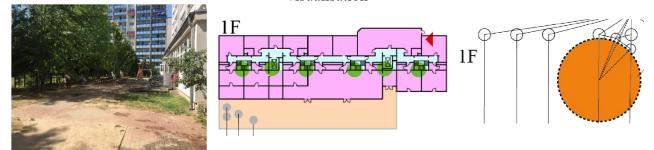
External PA space example (a) photo; (b) floor plan; (c) spatial analysis visualisation
